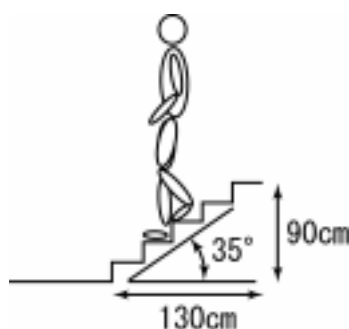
Anatomy of a typical stair (step height – riser 18cm, step depth – tread 26cm)
